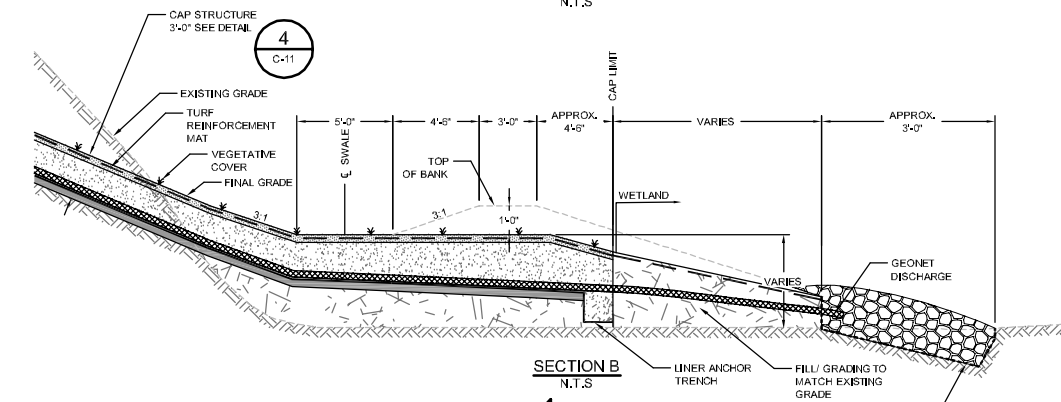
TURF REINFORCEMENT MAT STABILIZED SWALE
